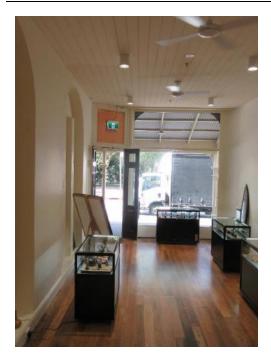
Interior of the shop at 141 George Street (G.13). The beaded timber board ceiling is not original fabric but is appropriate to the date of construction and character of the building. Source: TKD Architects 2020.
